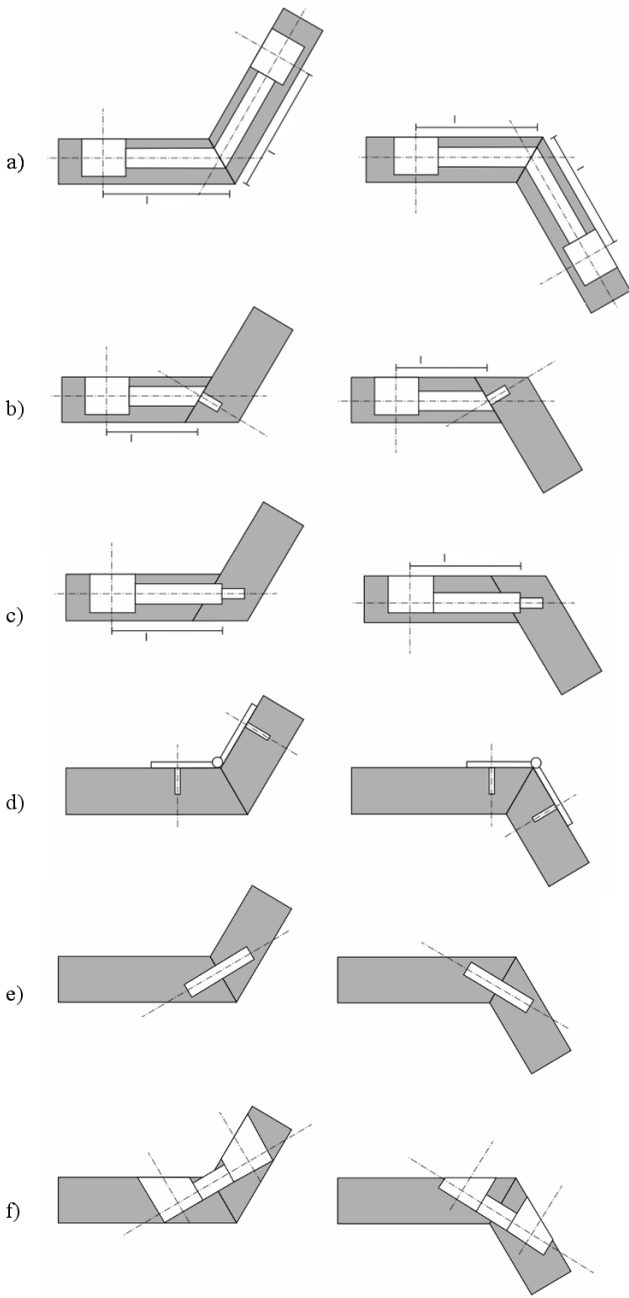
Different fasteners for the assembly of timber panels: Hinge joints {d}, hard wood dowels {e}, mechanical fasteners {a,b,c,f}
